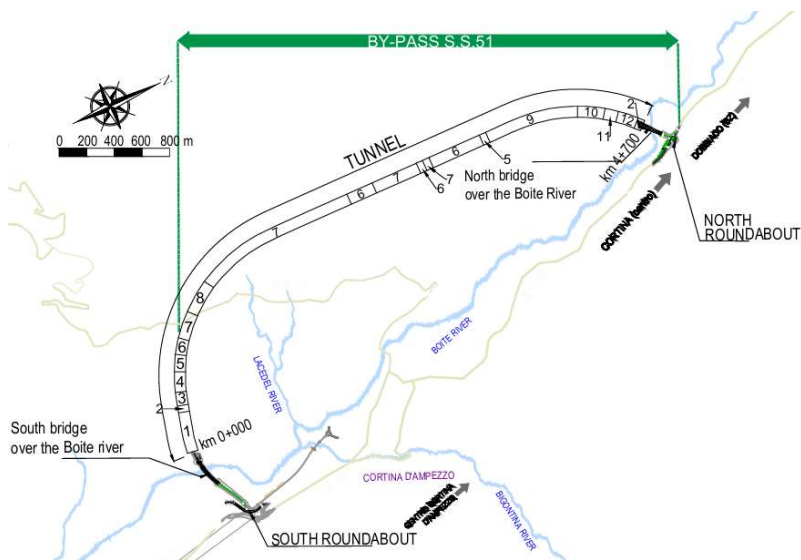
Plan view of the homogeneous sections along the tunnel chainage – Cortina d'Ampezzo tunnel
